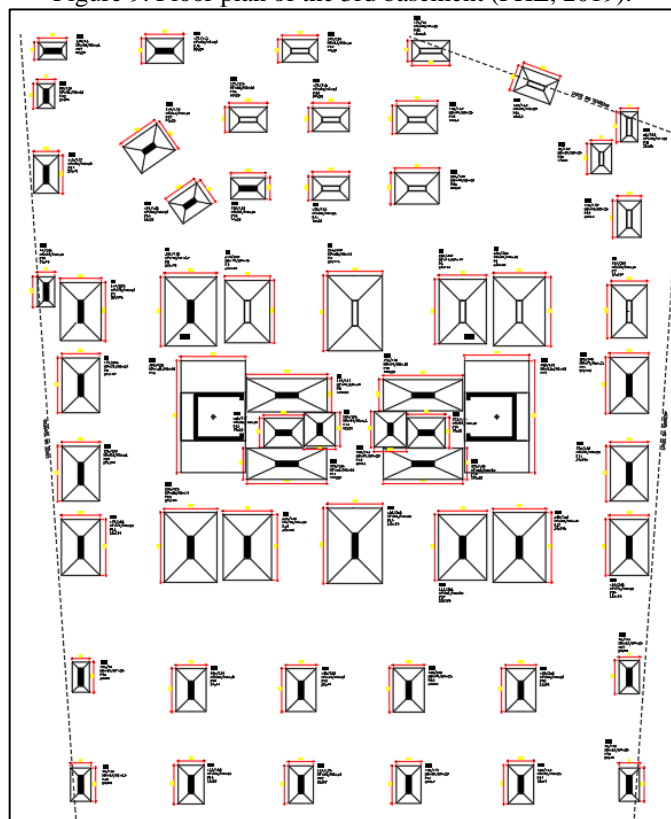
Floor plan of the 3rd basement (FHE, 2019).
